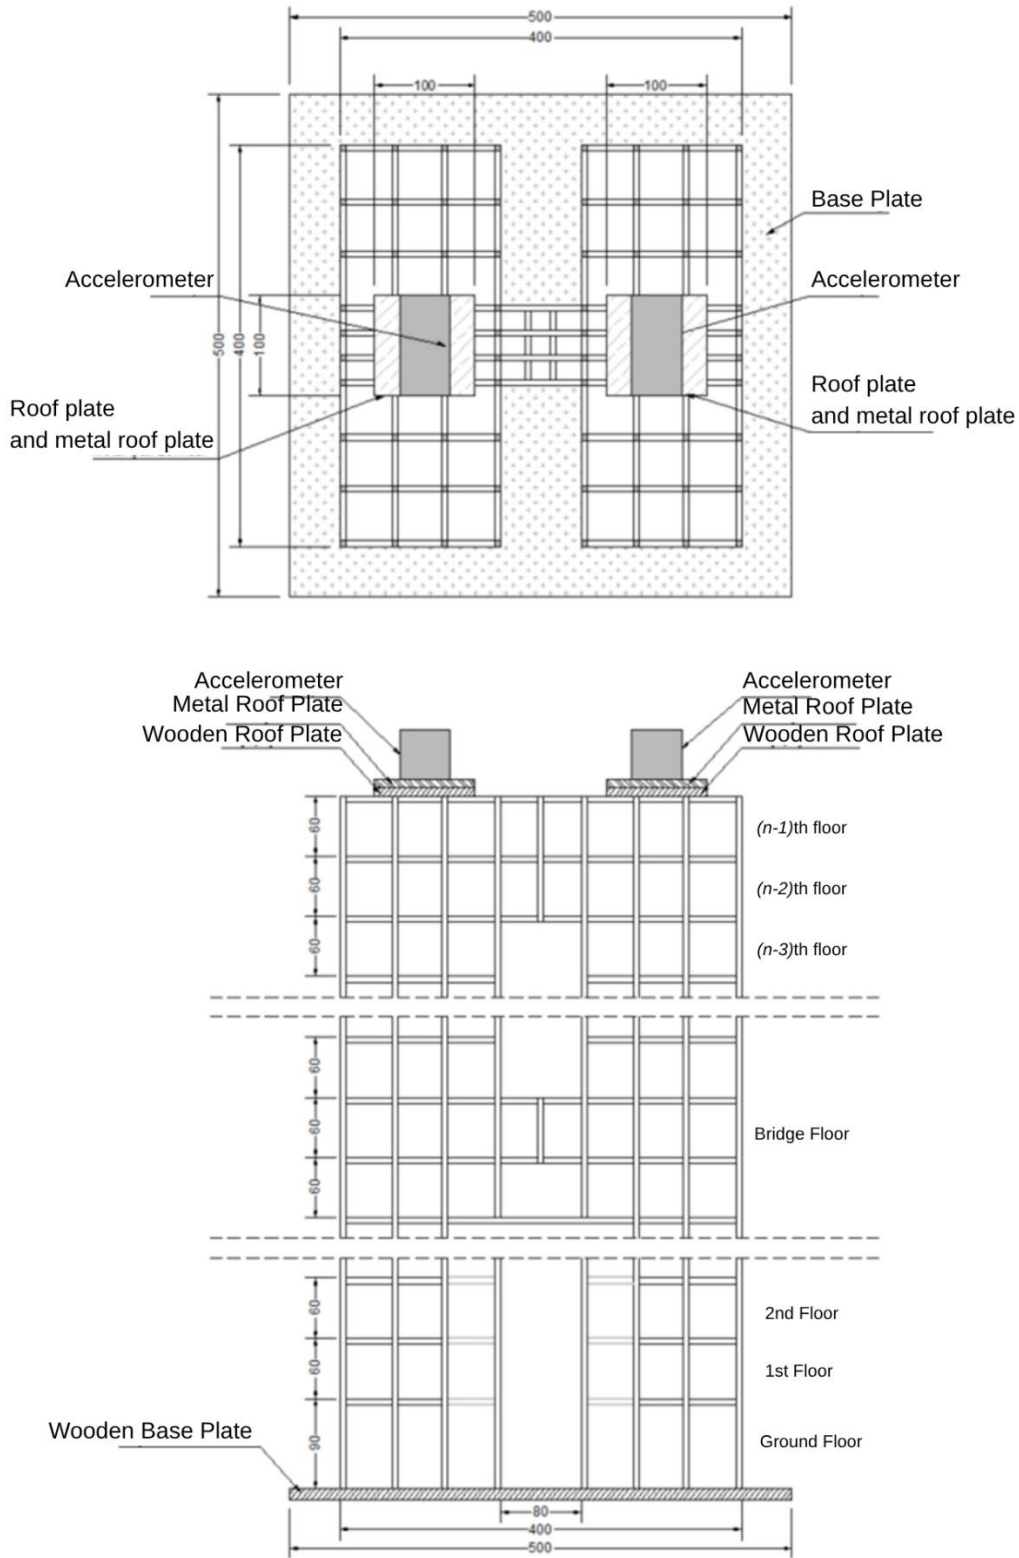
Plan (top) and section elevation (bottom) views of the plate, metal sheet, and accelerometers at the roof level
